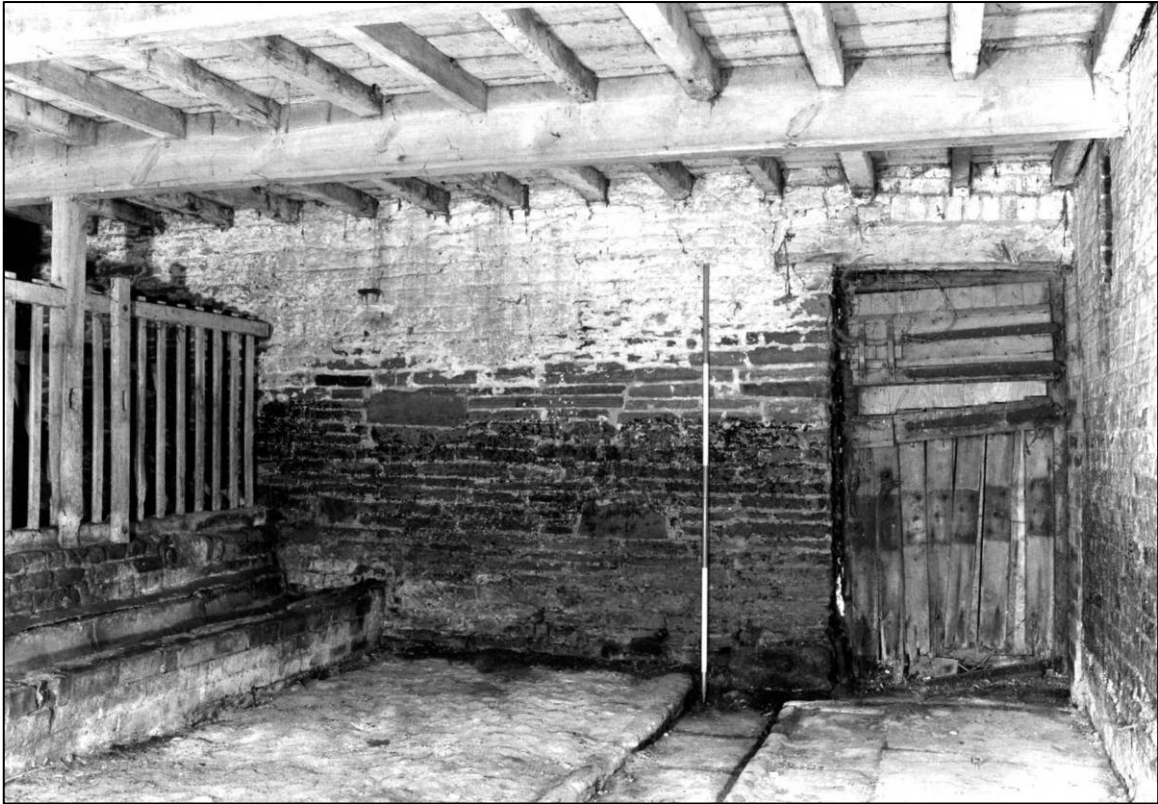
East barn range, S ground floor cell, looking W (photo 4/12).
